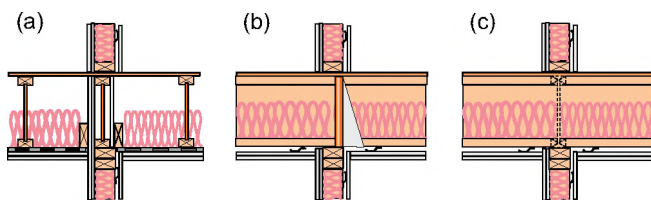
Construction details of the 3 wall/floor systems. Joists were oriented (a) parallel to the wall, (b) perpendicular to the wall, and (c) with joists continuous across the wall, perpendicular to it.
